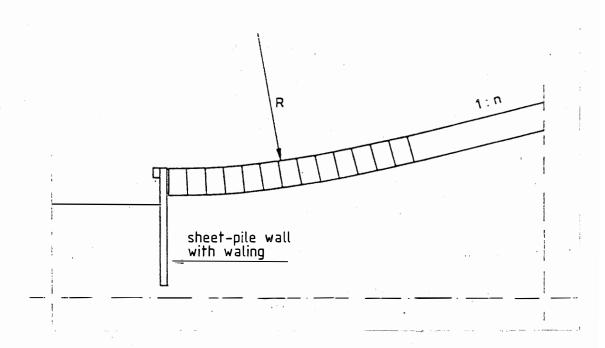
Toe structure with timber sheet-pile wall as a possible solution for lake dykes.
